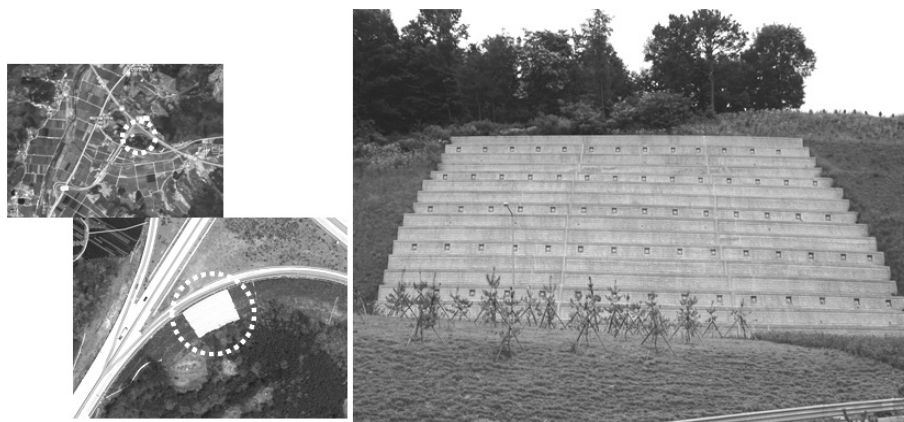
Site II for test construction (terraced retaining wall of cut slope in Shinyang IC).
